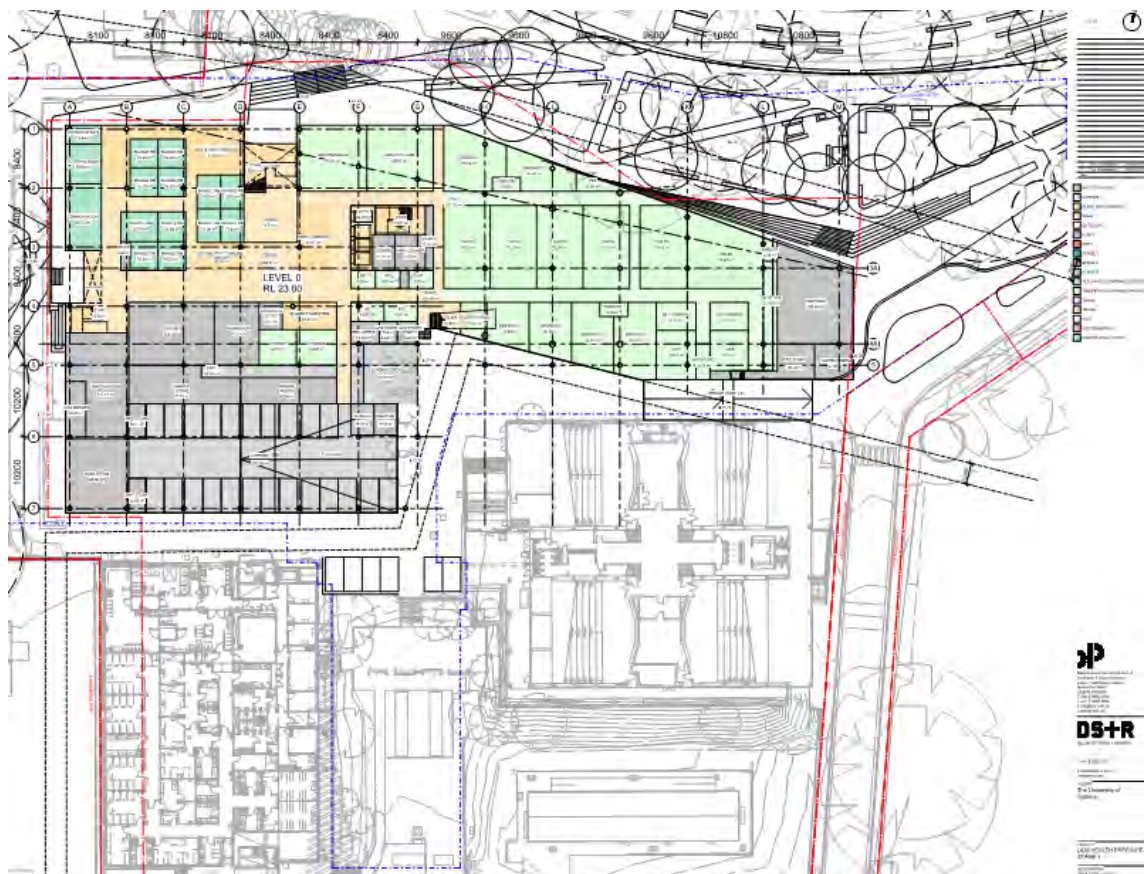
Stage 1 Area Plan – Level 0 (Source: BLP/DSR Architects)
